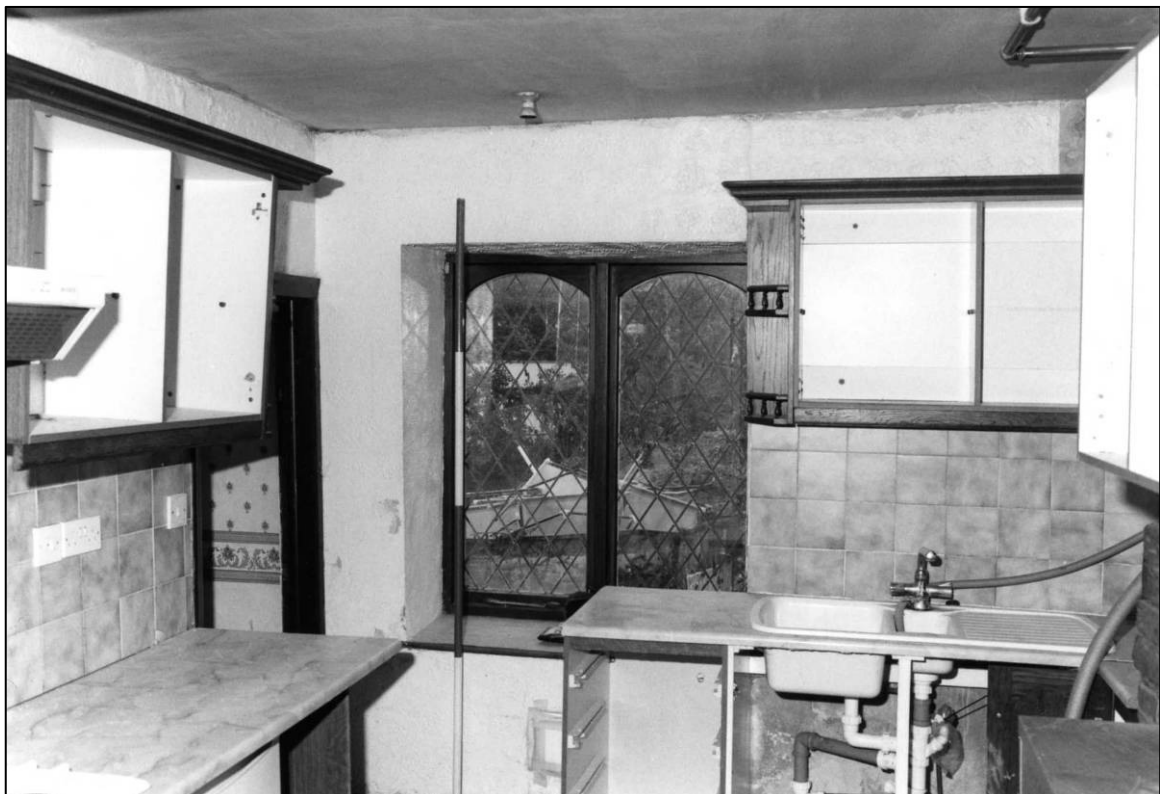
Barn Cottage range, N part, central ground floor room (Room 1), looking E (photo 11/6).
